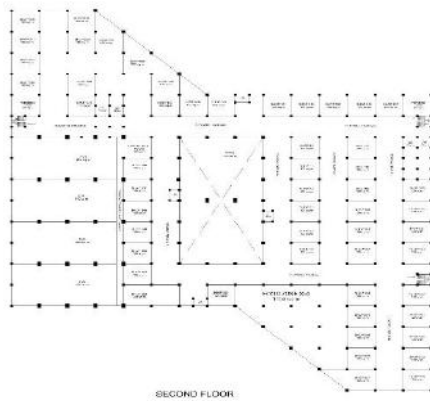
Second floor plan Area of Second floor : 19000 sqm
